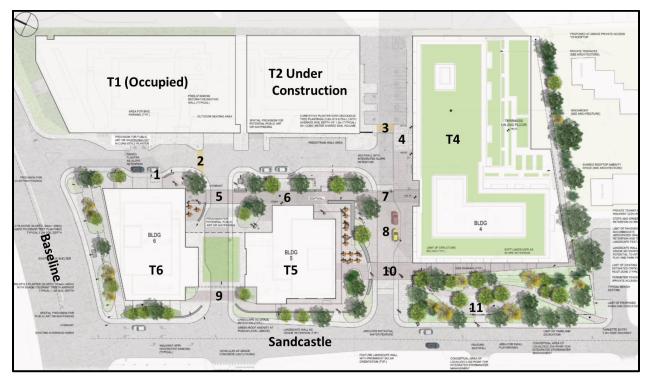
Landscaping Plan and Proposed Pedestrian Facilities
